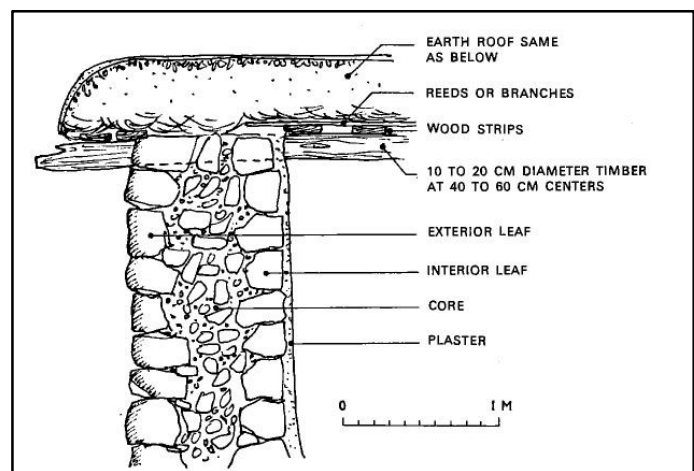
Wall Construction with a Flat Roof in Lebanese Context. Source: (Ragette, 1974) Accessed: 22-1-2021
